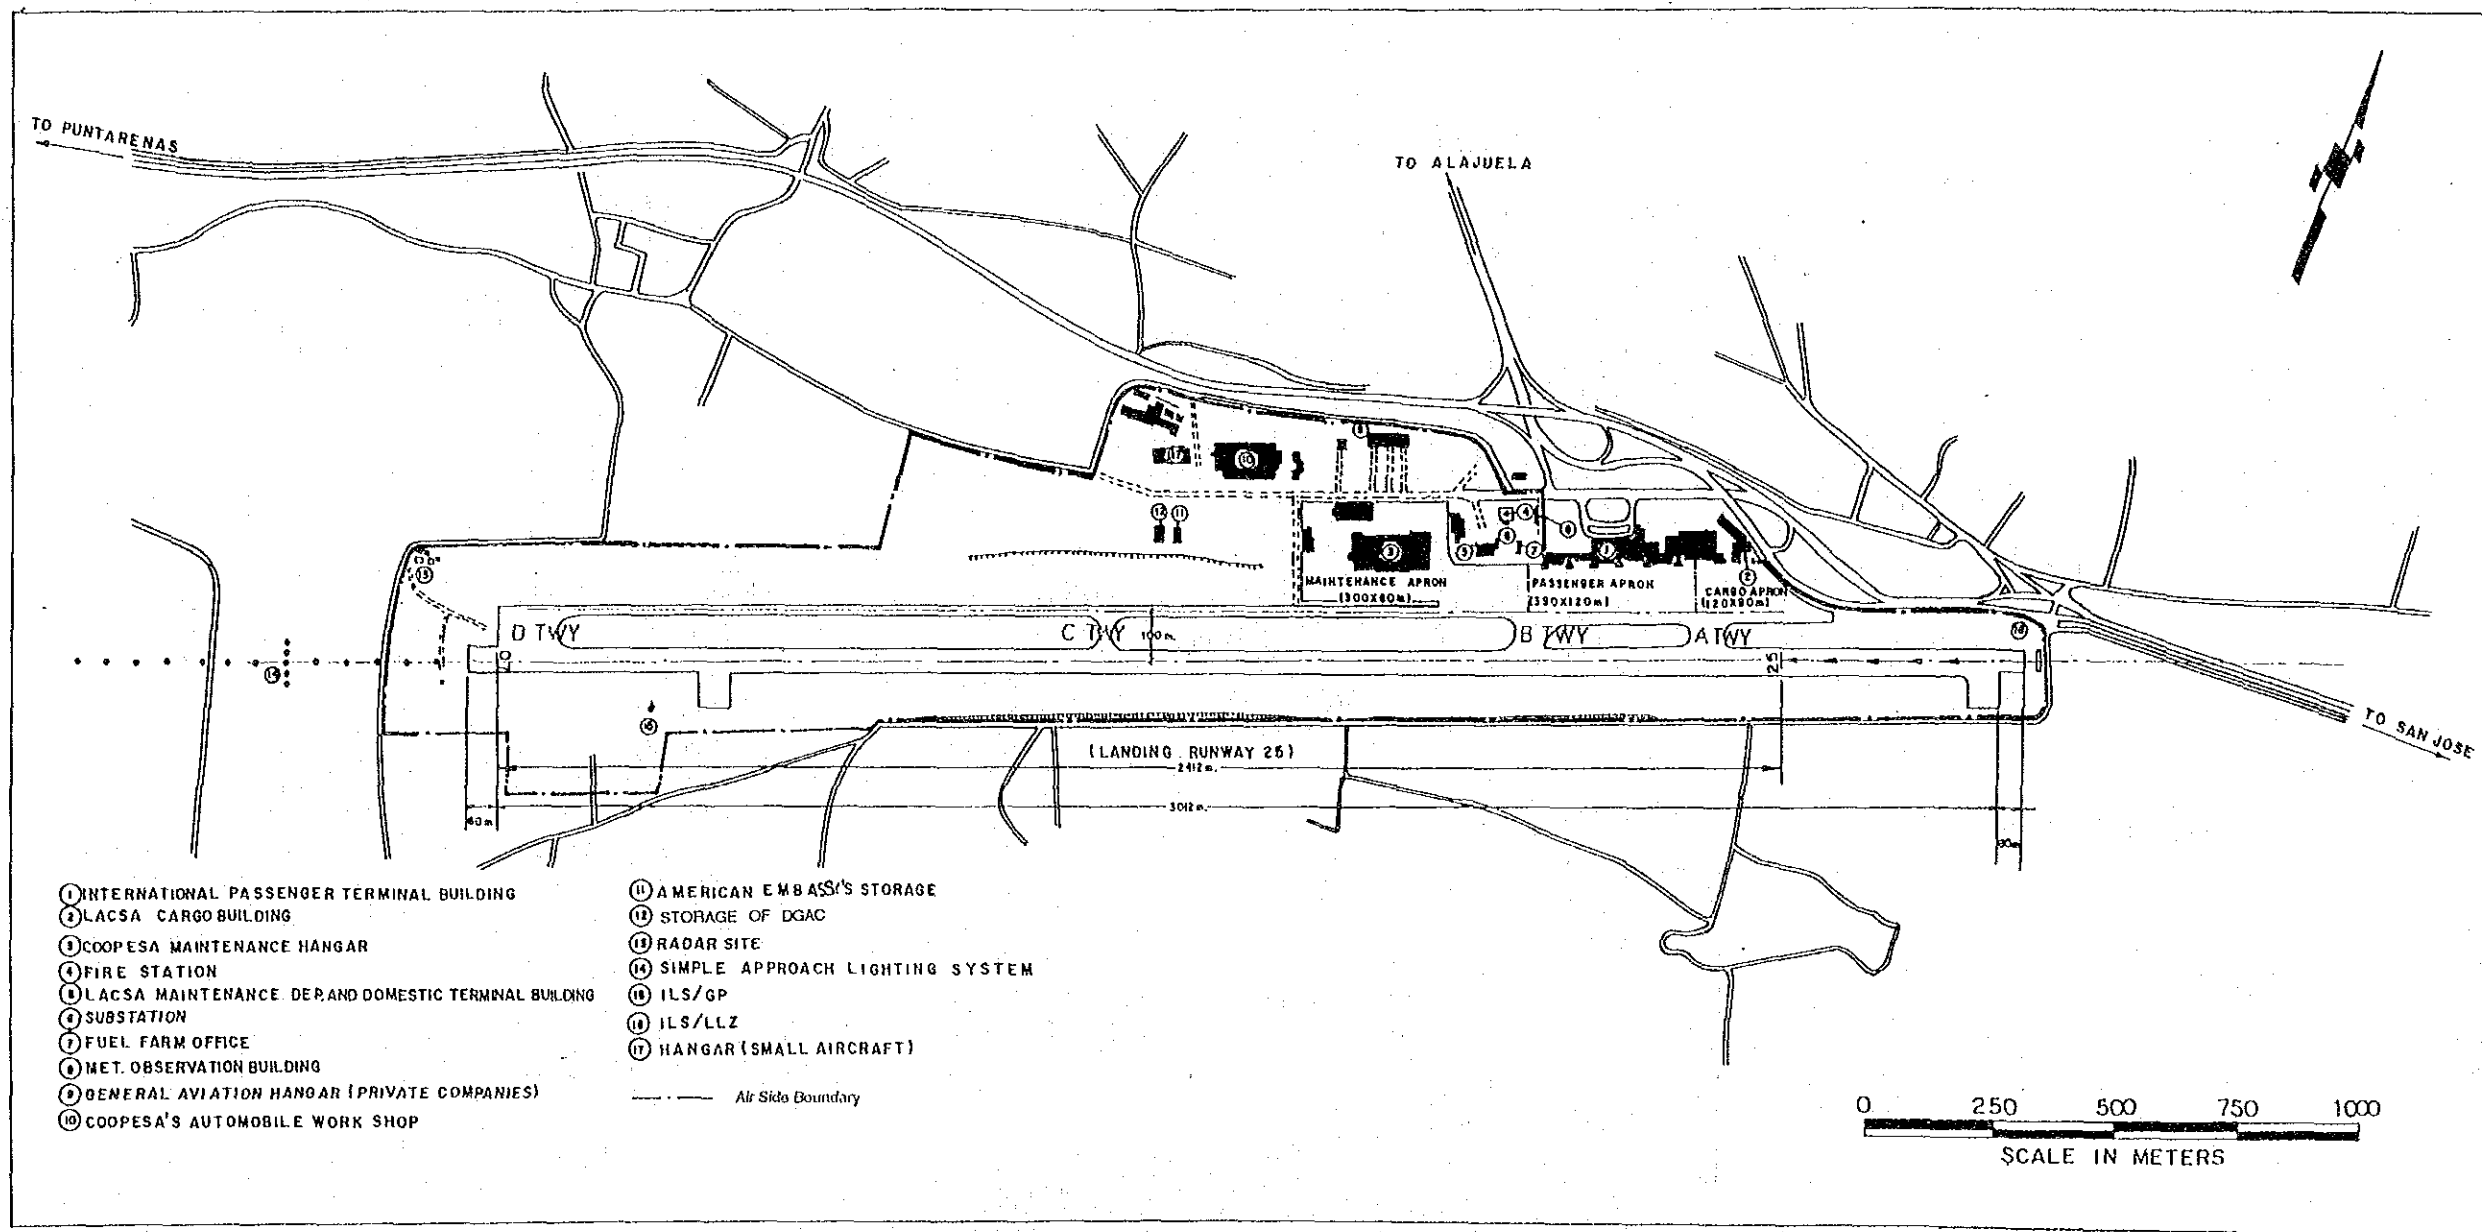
Layout Plan of Existing Juan Santamaria International Airport
